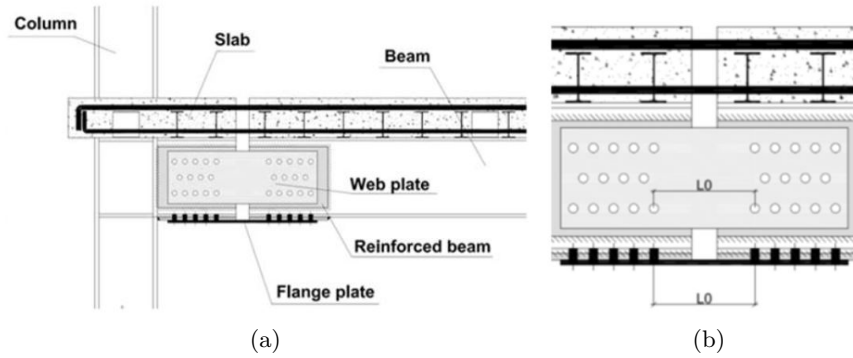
(a) Bolted fuse connection arrangement with the presence of a concrete slab and (b) elevation of the bolted fuse (Vayas et al., 2013)
